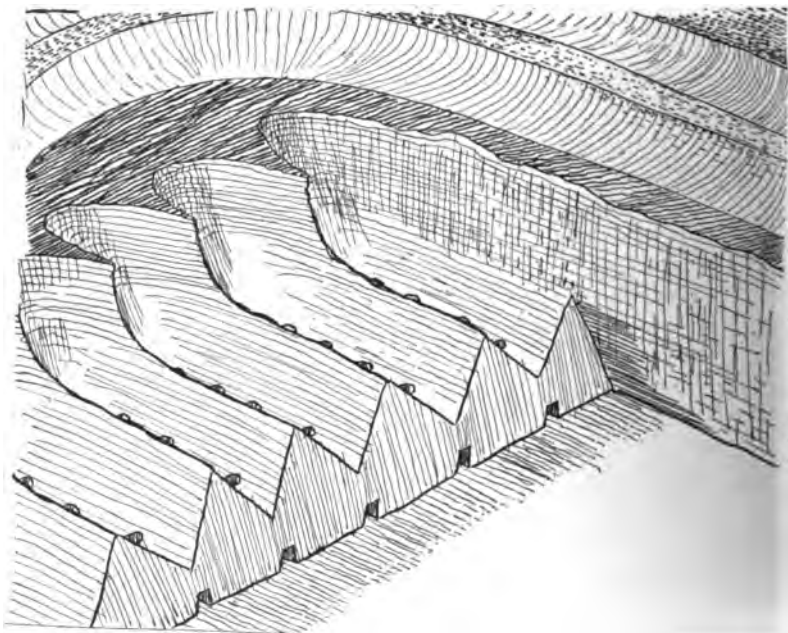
APPEARANCE OF A PIT IN WHICH A MECHANICAL CUTTER WAS USED TO MINE AND LOAD THE COAL.
